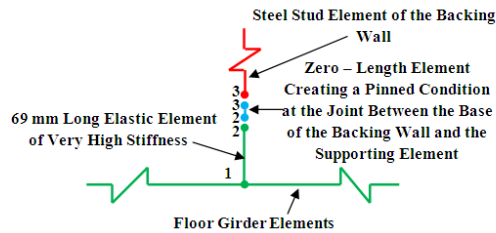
Attachment of Base of Stud Backed Wall to Frame
